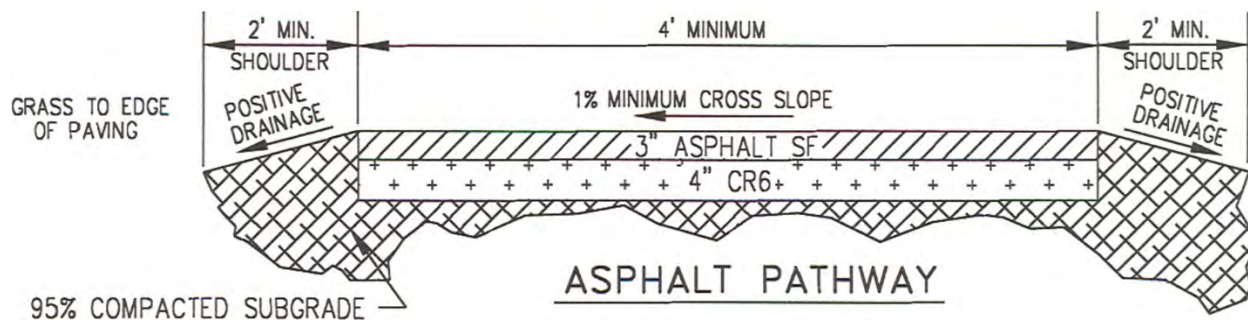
EXCERPT FROM CHARLES COUNTY STANDARD DETAIL R-2.47 (PEDESTRIAN TRAVEL WAYS)
